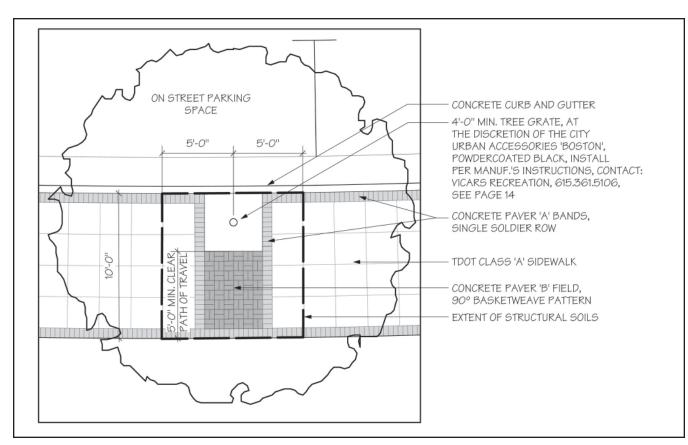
Sidewalk Detail Plan-Field paver pattern for sidewalk adjacent to on street parking (permanent or temporary).
